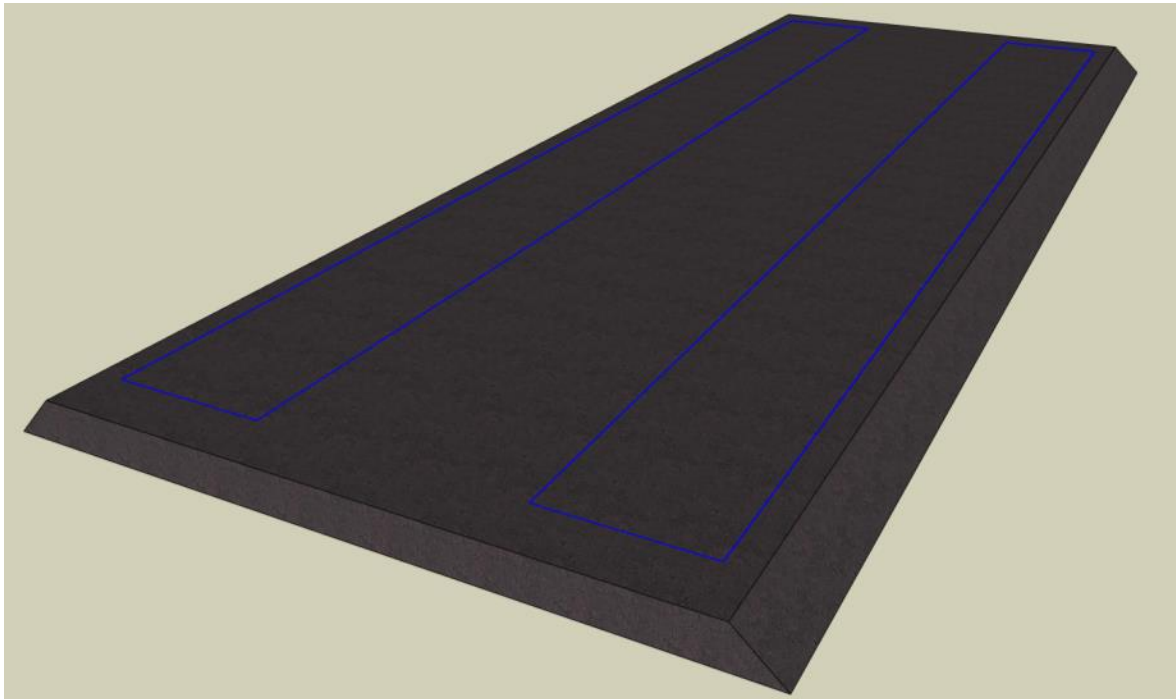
MARKING OF LONGITUDINAL BEAM POSITIONING
